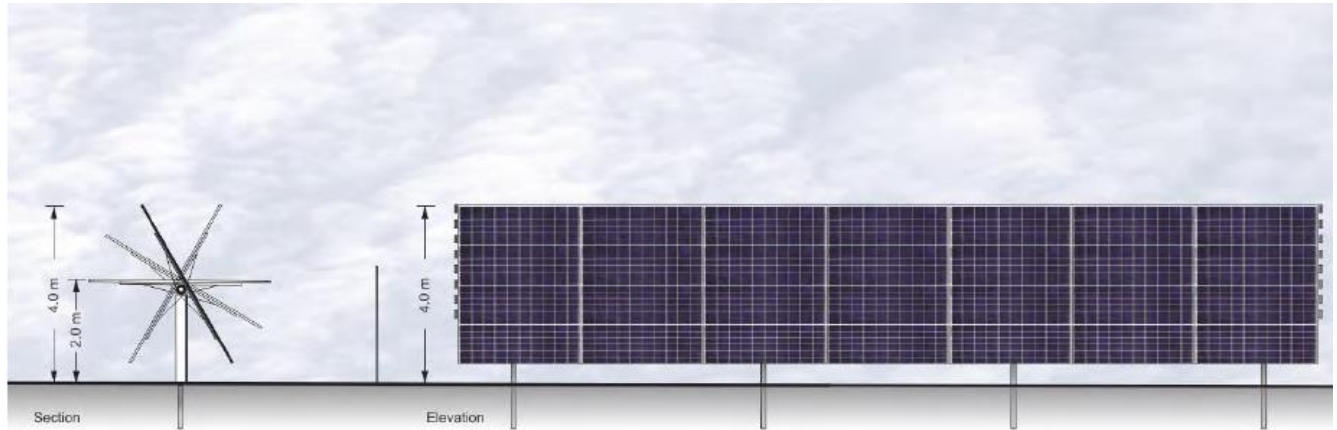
Panel Layout and Site Boundary - (Source: Stringybark Solar Farm Pty Ltd)
